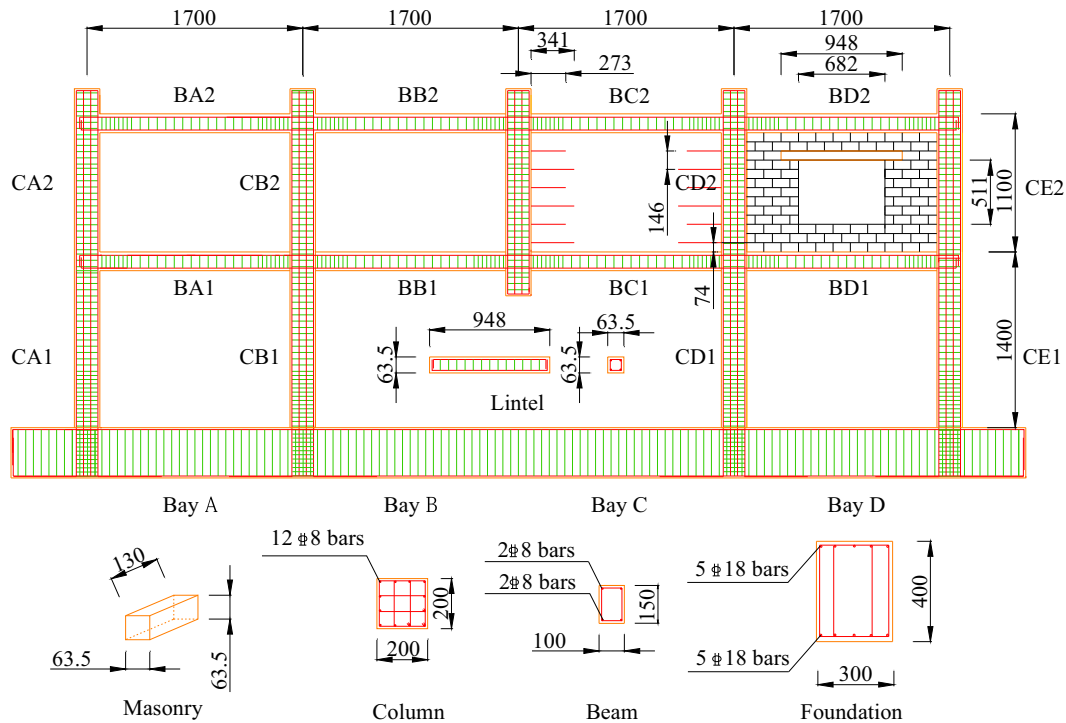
Design details of test frame specimens (Bays A and B illustrate the case without infill walls; Bay C illustrates tie rebars between columns and infill walls; and bay D illustrates the case with infill walls. Unit: mm).
